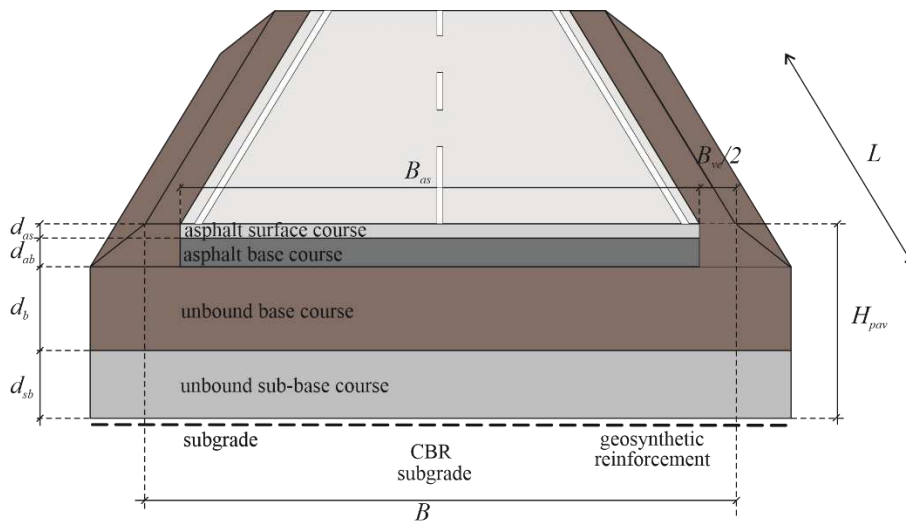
Cross section of the pavement design with the geometrical parameters shown.
